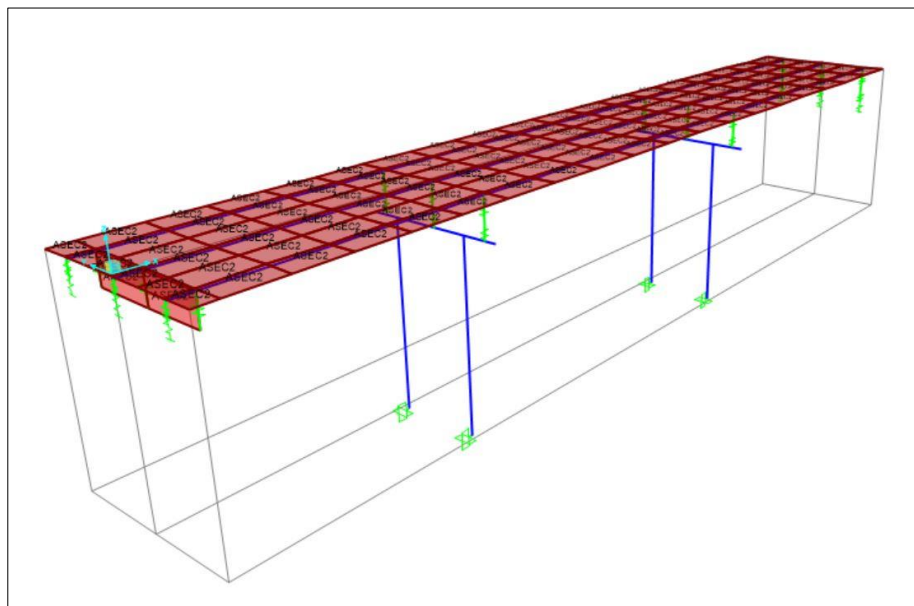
SR520 concrete bridges with box beam deck (prefabricated)
